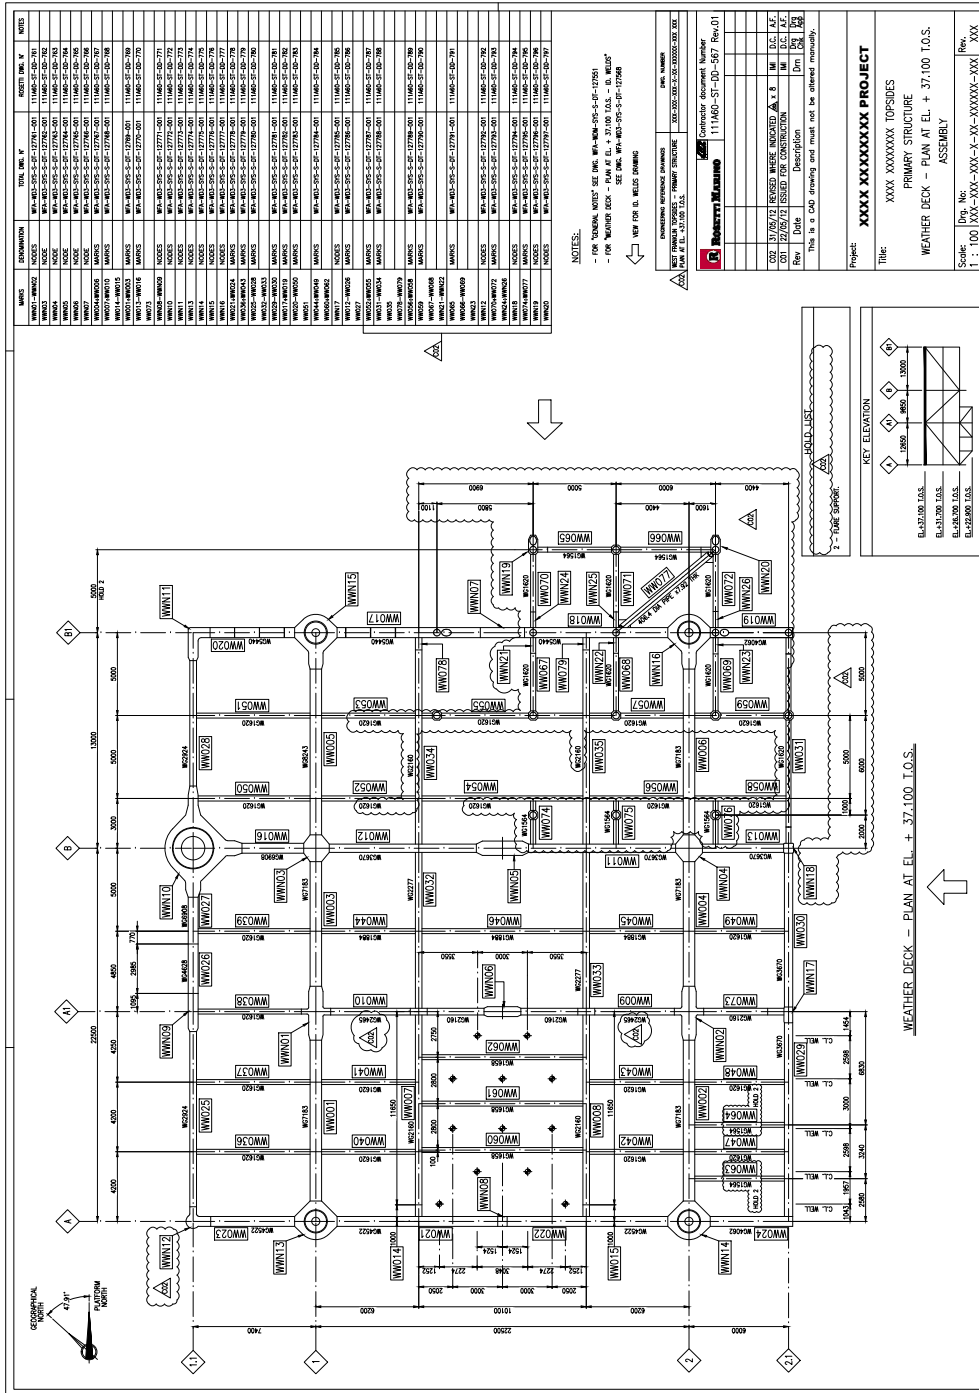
Weather level deck - Shop drawing - Plan view - Primary structure
